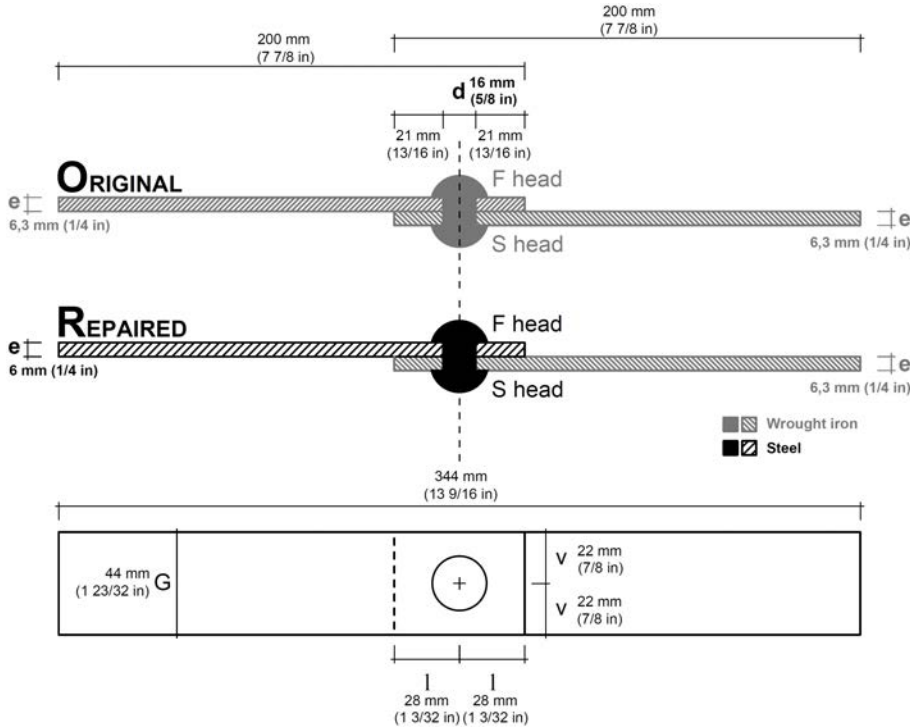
Elevation and plan views of the single riveted specimens belonging to the types O and R⁶
